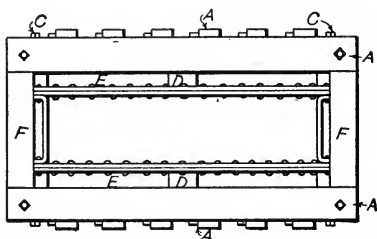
TOP PLAN OF BRICKWORK FOR LARGER KETTLE
